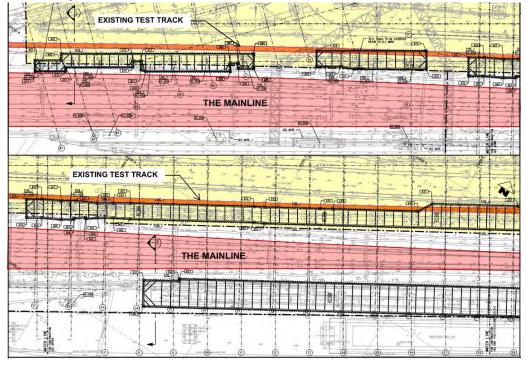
Sheet Pile Layout Plan - G.L. A1-6/P-Q (Top) and G.L. 6-19/P-Q (Bottom)
